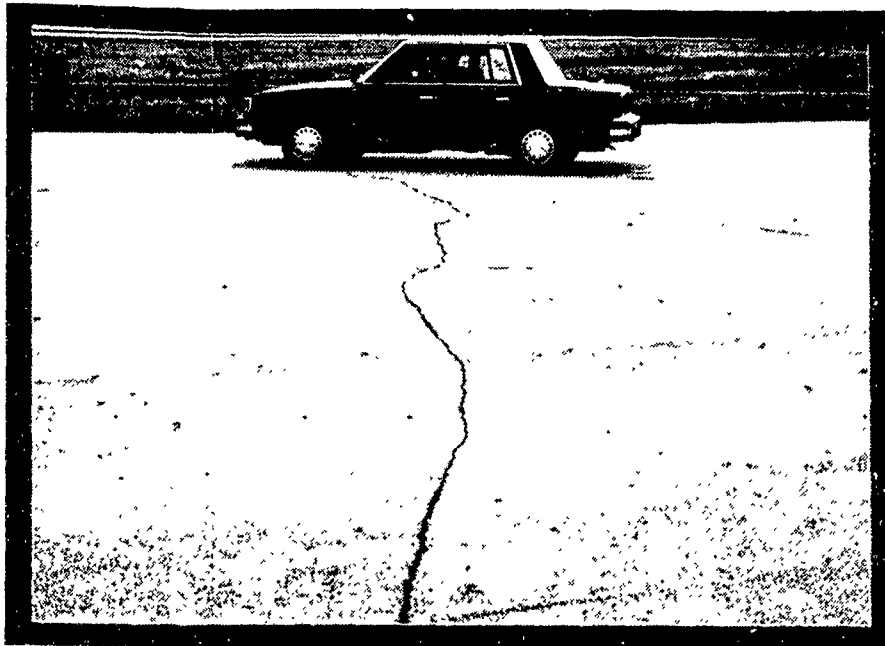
AC SHRINKAGE CRACK ON TAXIWAY C WHICH REQUIRES ROUTING AND SEALING ASAP (TYPICAL)
